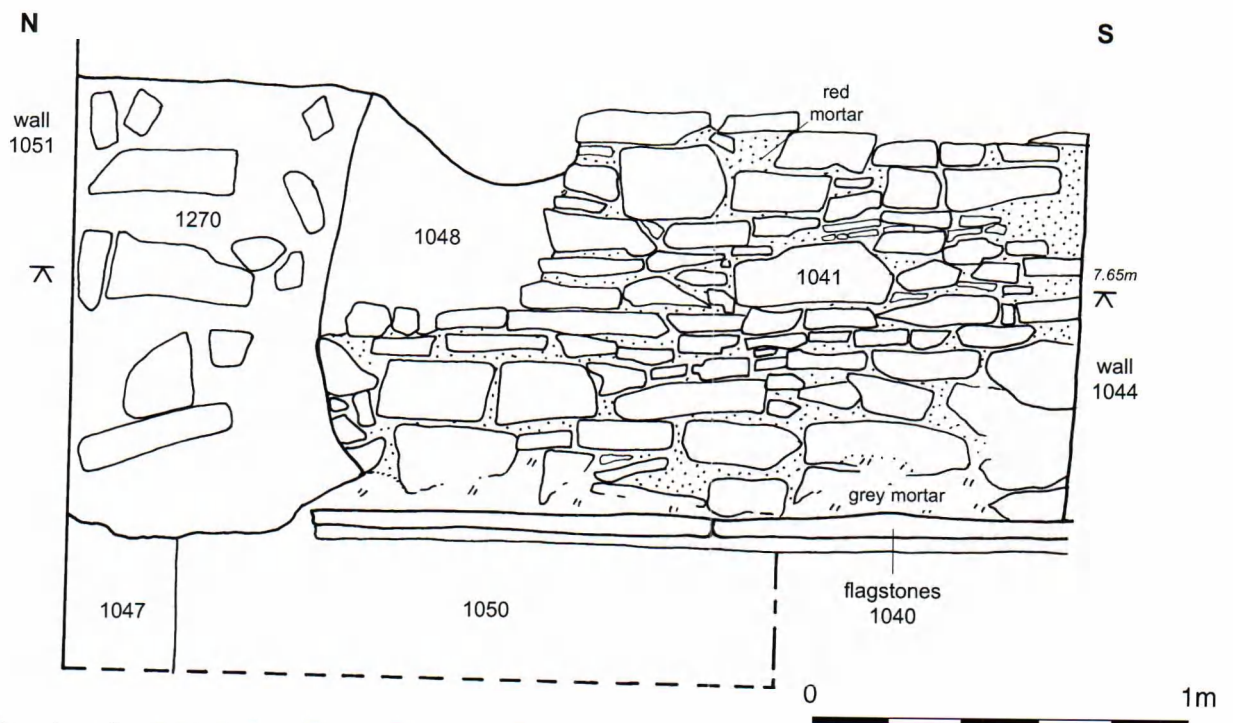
Elevation of wall 1041, Piles F1 and F2, scale 1:20.
